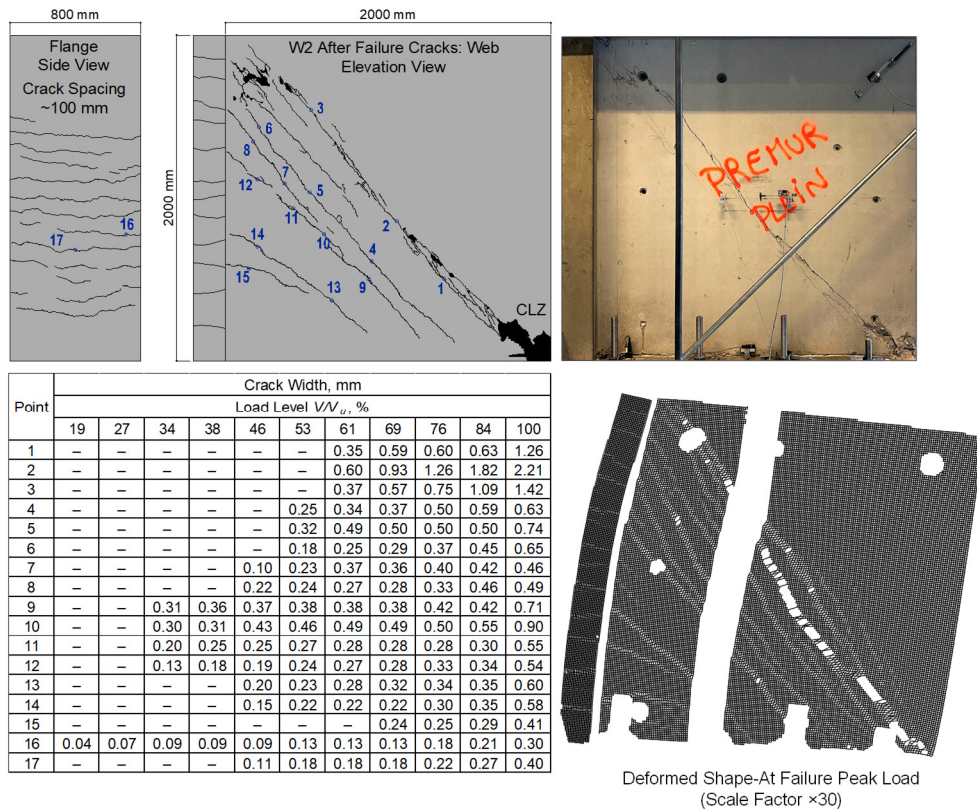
Crack pattern (major cracks) of wall W2 after failure, crack widths at various load levels, and deformed shape at peak load.
